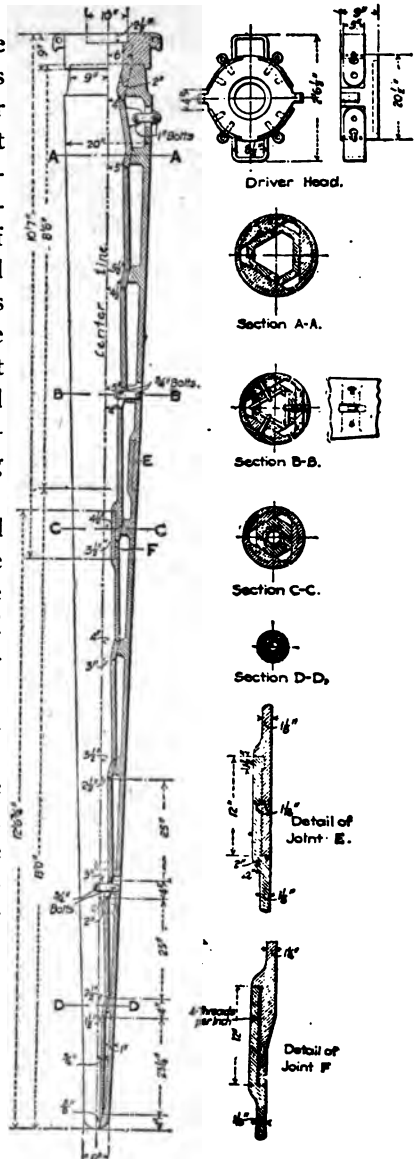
Collapsible Core, Raymond Concrete Piles.
